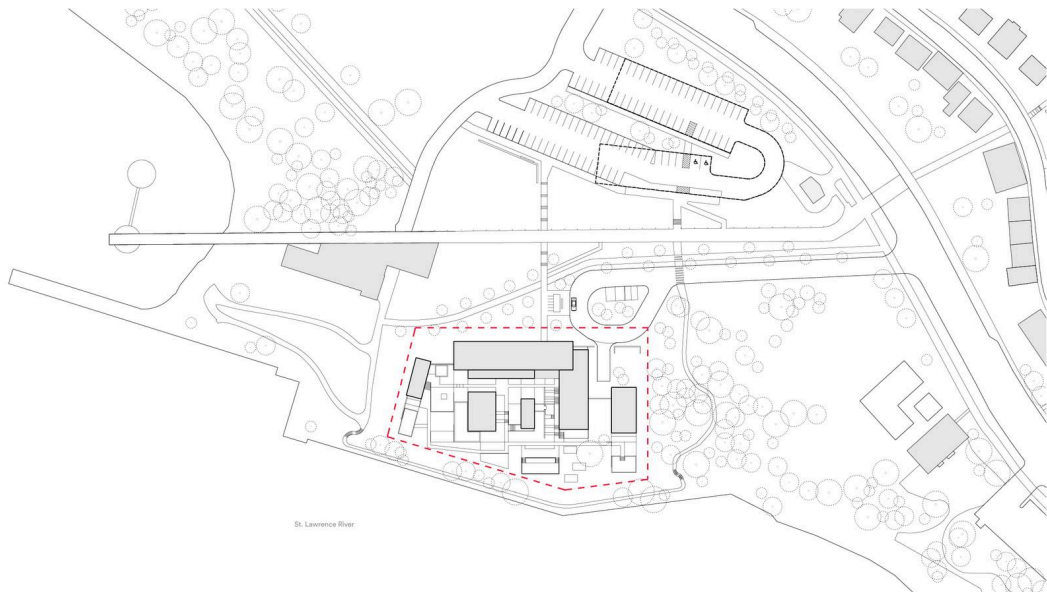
Strøm Spa Vieux-Québec* site plan
